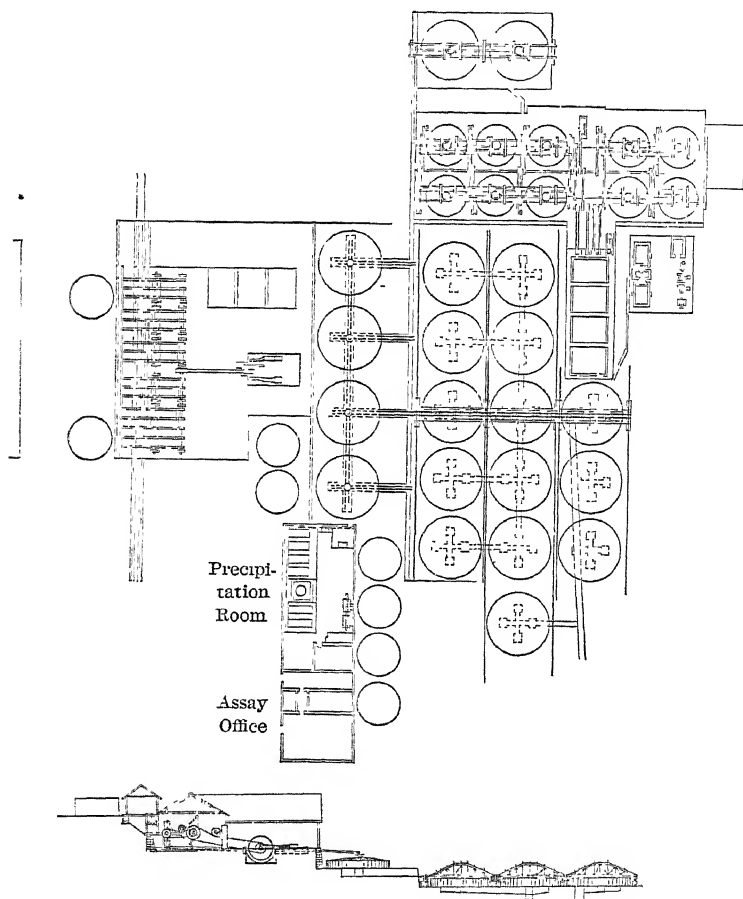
PLAN AND SECTIONAL ELEVATION OF MILL AND CYANIDE-PLANT.
